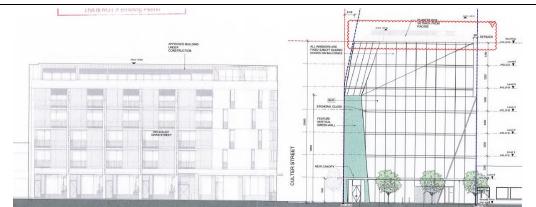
The six-storey mixed use development at No. 429 – 437 Swan Street (left) and the six-storey office development located at No. 439 – 443 Swan Street (Council Endorsed Plans)
